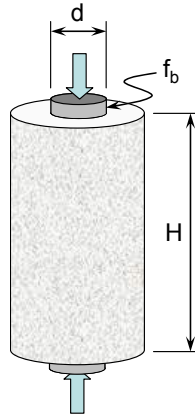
Detail of the specimens tested by Adebar and Zhou (1993)
